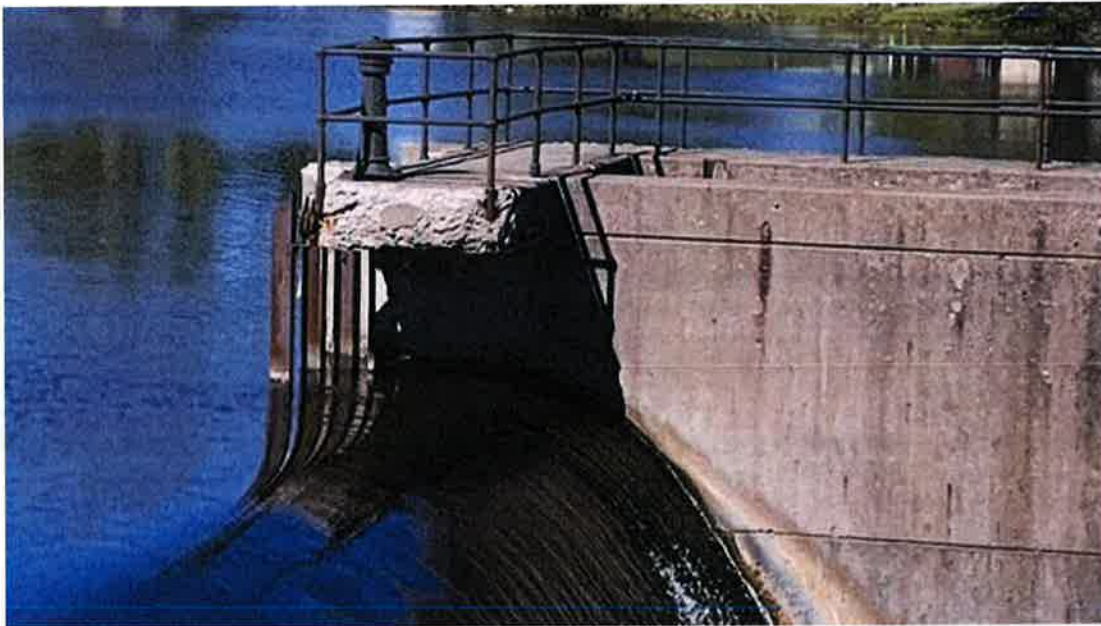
Spillway left upstream abutment wall. Note concrete deterioration of gate operator deck
